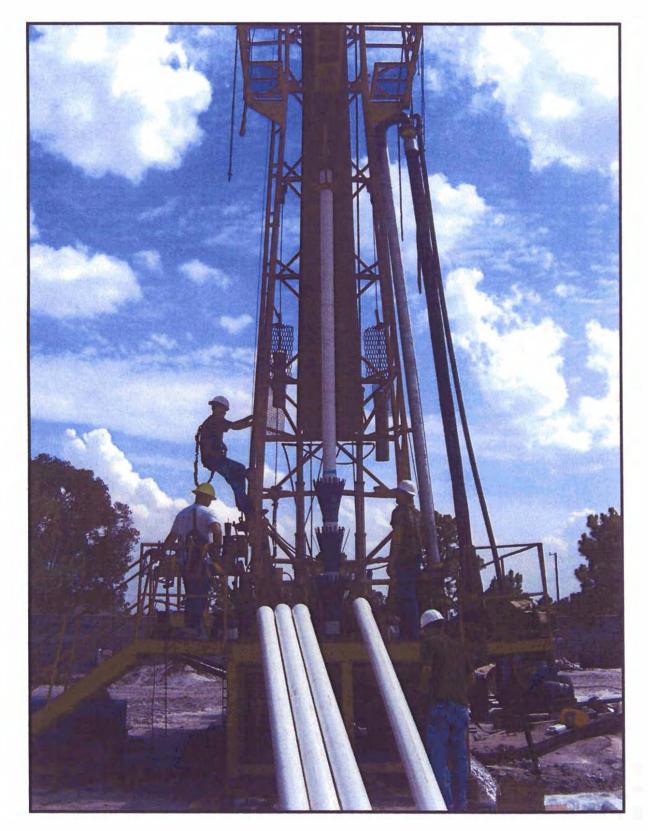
Installing First Section of 6-inch PVC Casing (note baskets attached)
